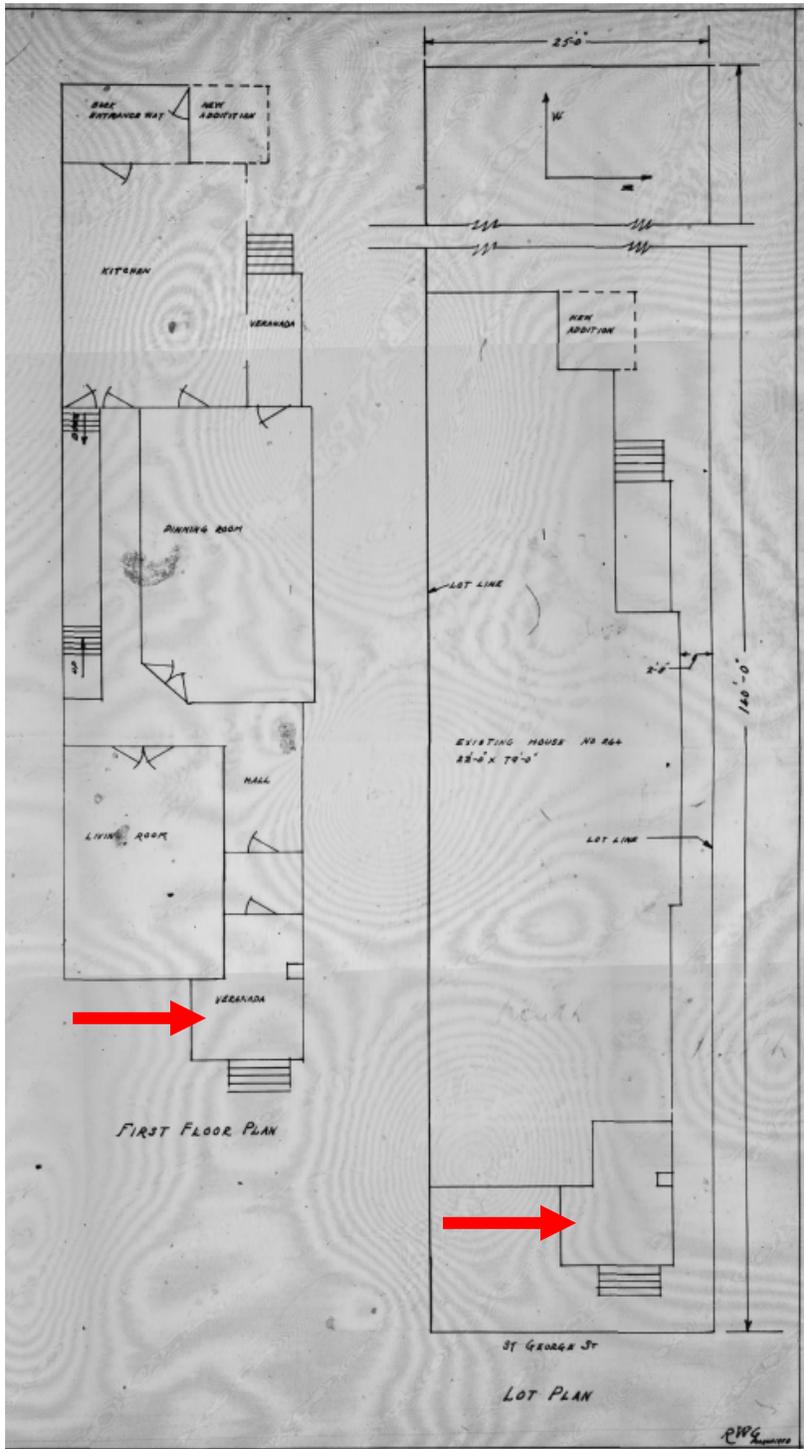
Excerpt from 1950 building application plan that shows previous presence of front balcony over central entrance (CTA).
